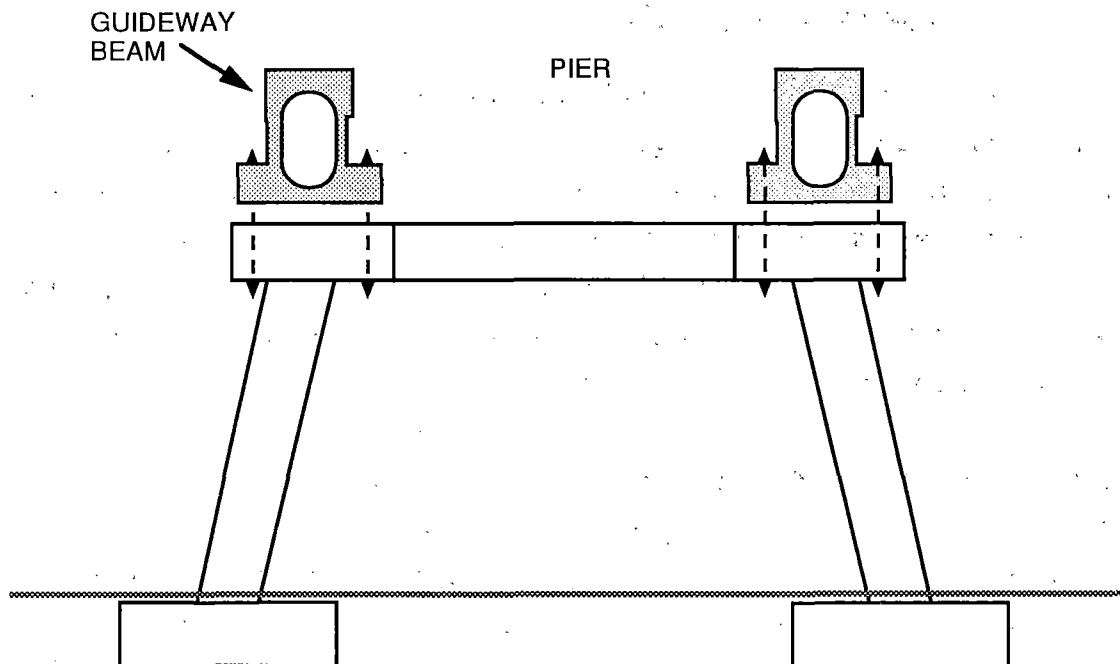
GUIDEWAY CROSS-SECTION
